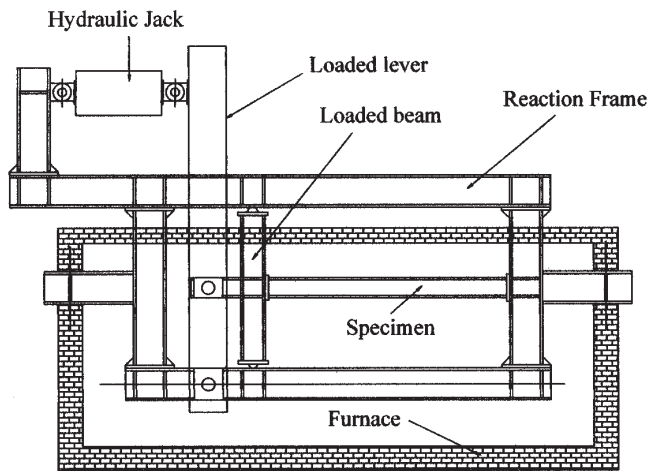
Test setup for columns with damaged fireproofing (figure courtesy of G.-Q. Li).
